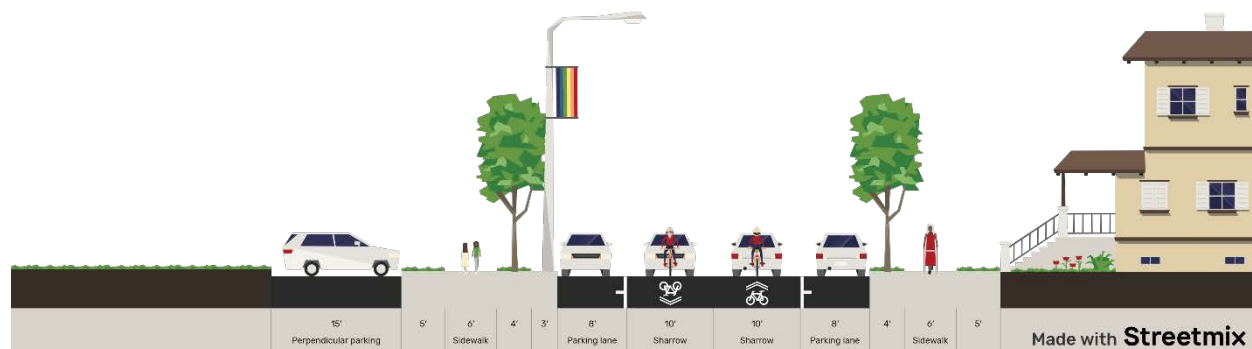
This proposed street section includes shared bike space on the driving lane with the proper Sharrow street marking. To provide better pedestrian space, this proposed street section carved out the space from planting strips to add more space on the sidewalk. Diagram created in Streetmix by EC, 2023
